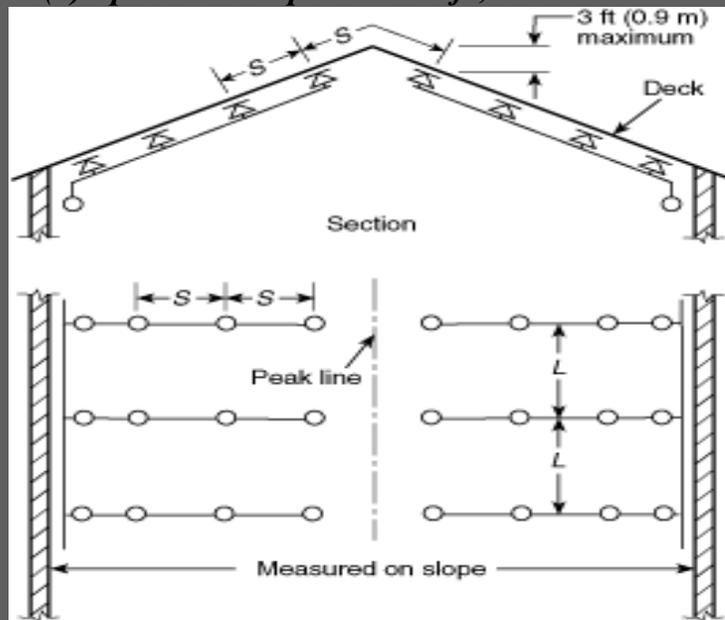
(b) Sprinklers at pitched roofs; branch lines run up the slope.
